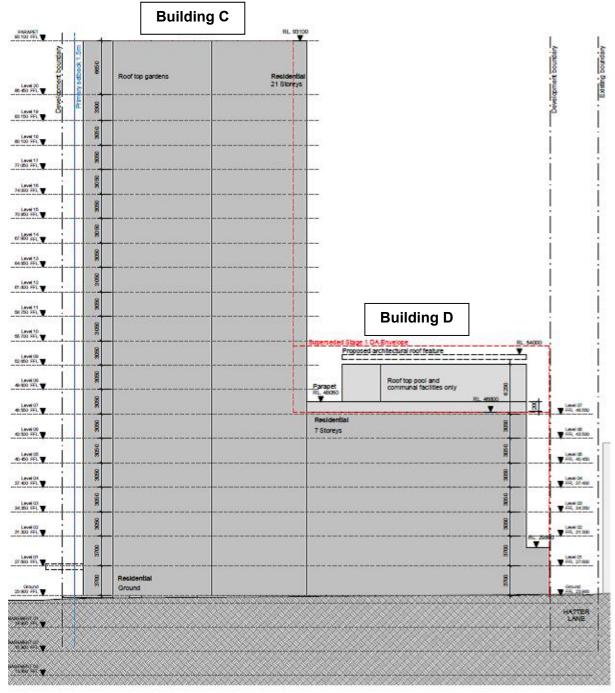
Dunkerley Place elevation illustrating Building C and Building D envelopes.
